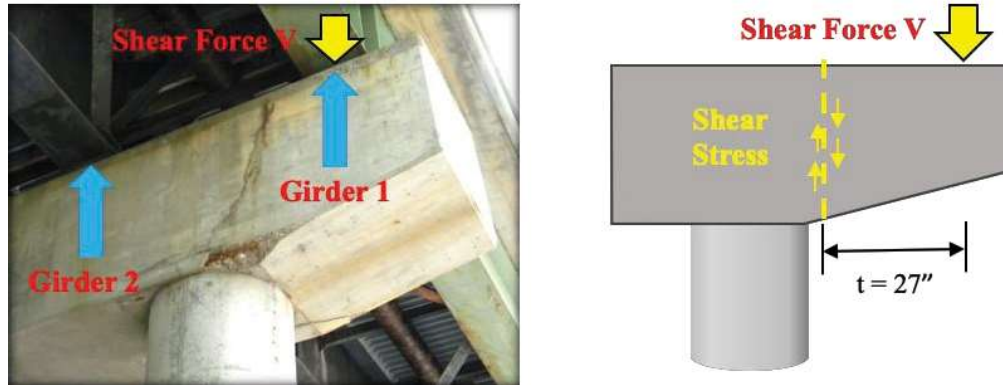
Field View of Cracked Pier-cap (left) and Shear Stress of the Pier-cap (right)
